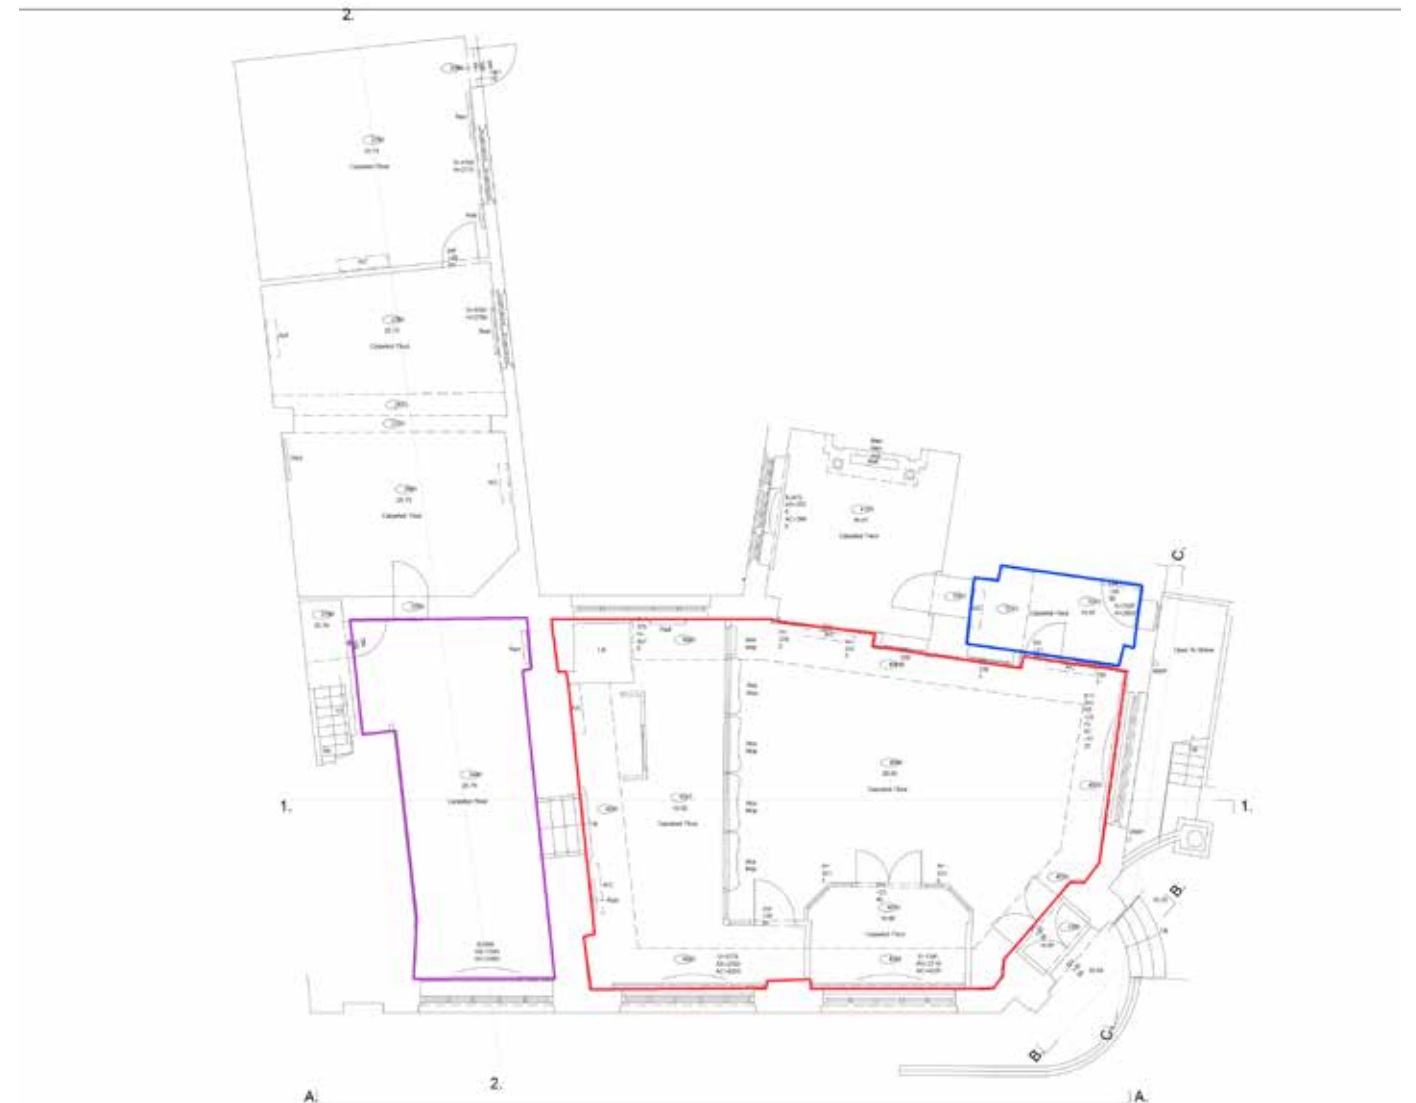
Ground Floor Plan of the building. Red = Bank Hall. Blue = Waiting Room. Purple = Upper Bank Hall
